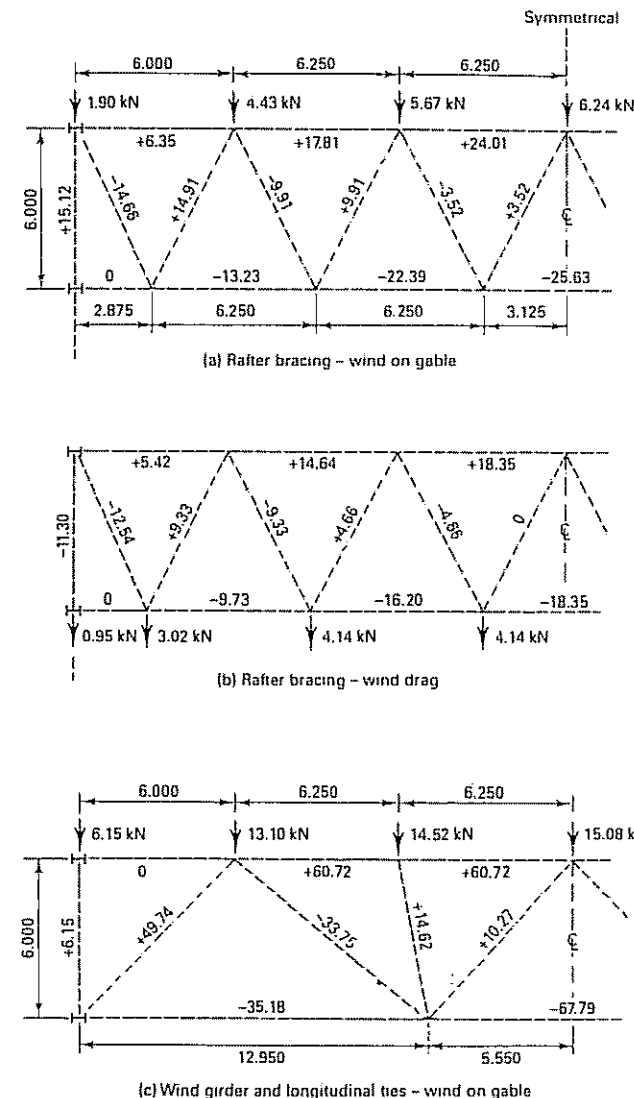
Rafter bracing and wind girder – unfactored member loads (kN)
